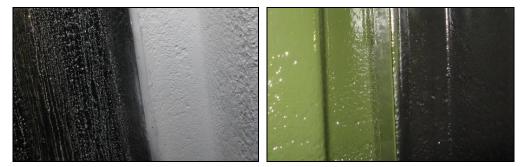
Side By Side Full Scale Corroded Sheet Pile Coating Trial Examples
